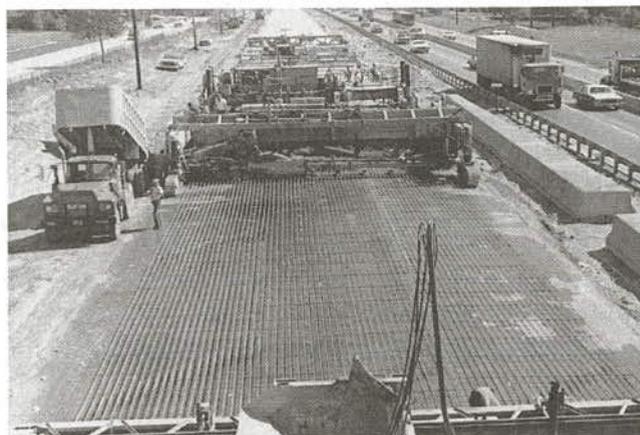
Construction of 10-in. continuously reinforced concrete pavement.
